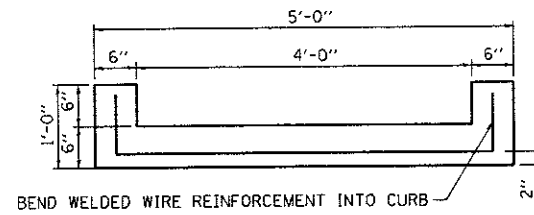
PARTIAL PAVED DITCH PLAN AT DRAINAGE STRUCTURES
